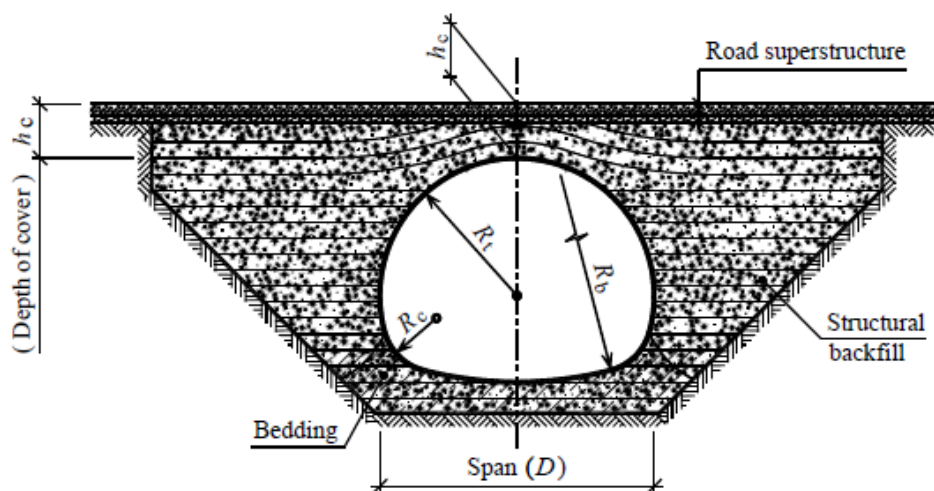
Typical configuration of a corrugated steel pipe arch culvert [1]
